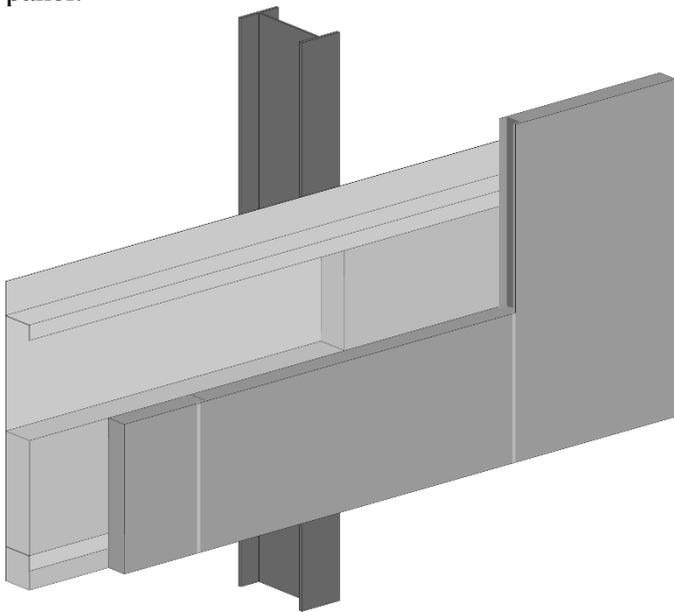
Hybrid element consisting of steel cassette and steel sandwich element. (Kuhnhenne et al., 2017)
